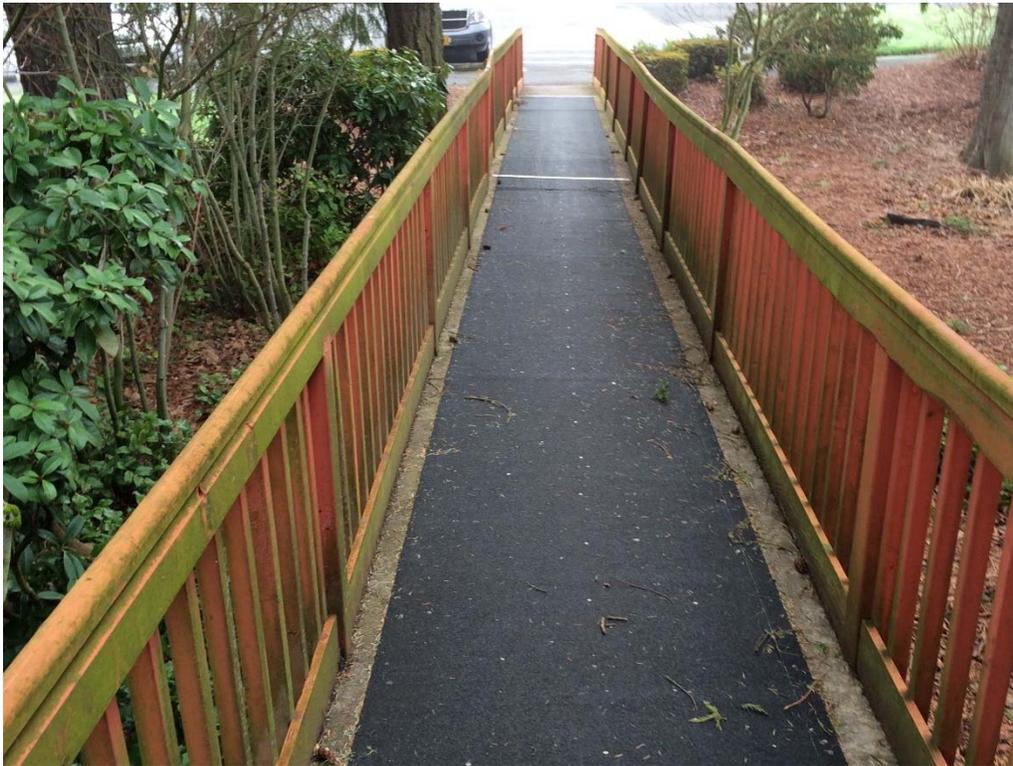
A Main entry is accessible via ramp from parking area (south)
